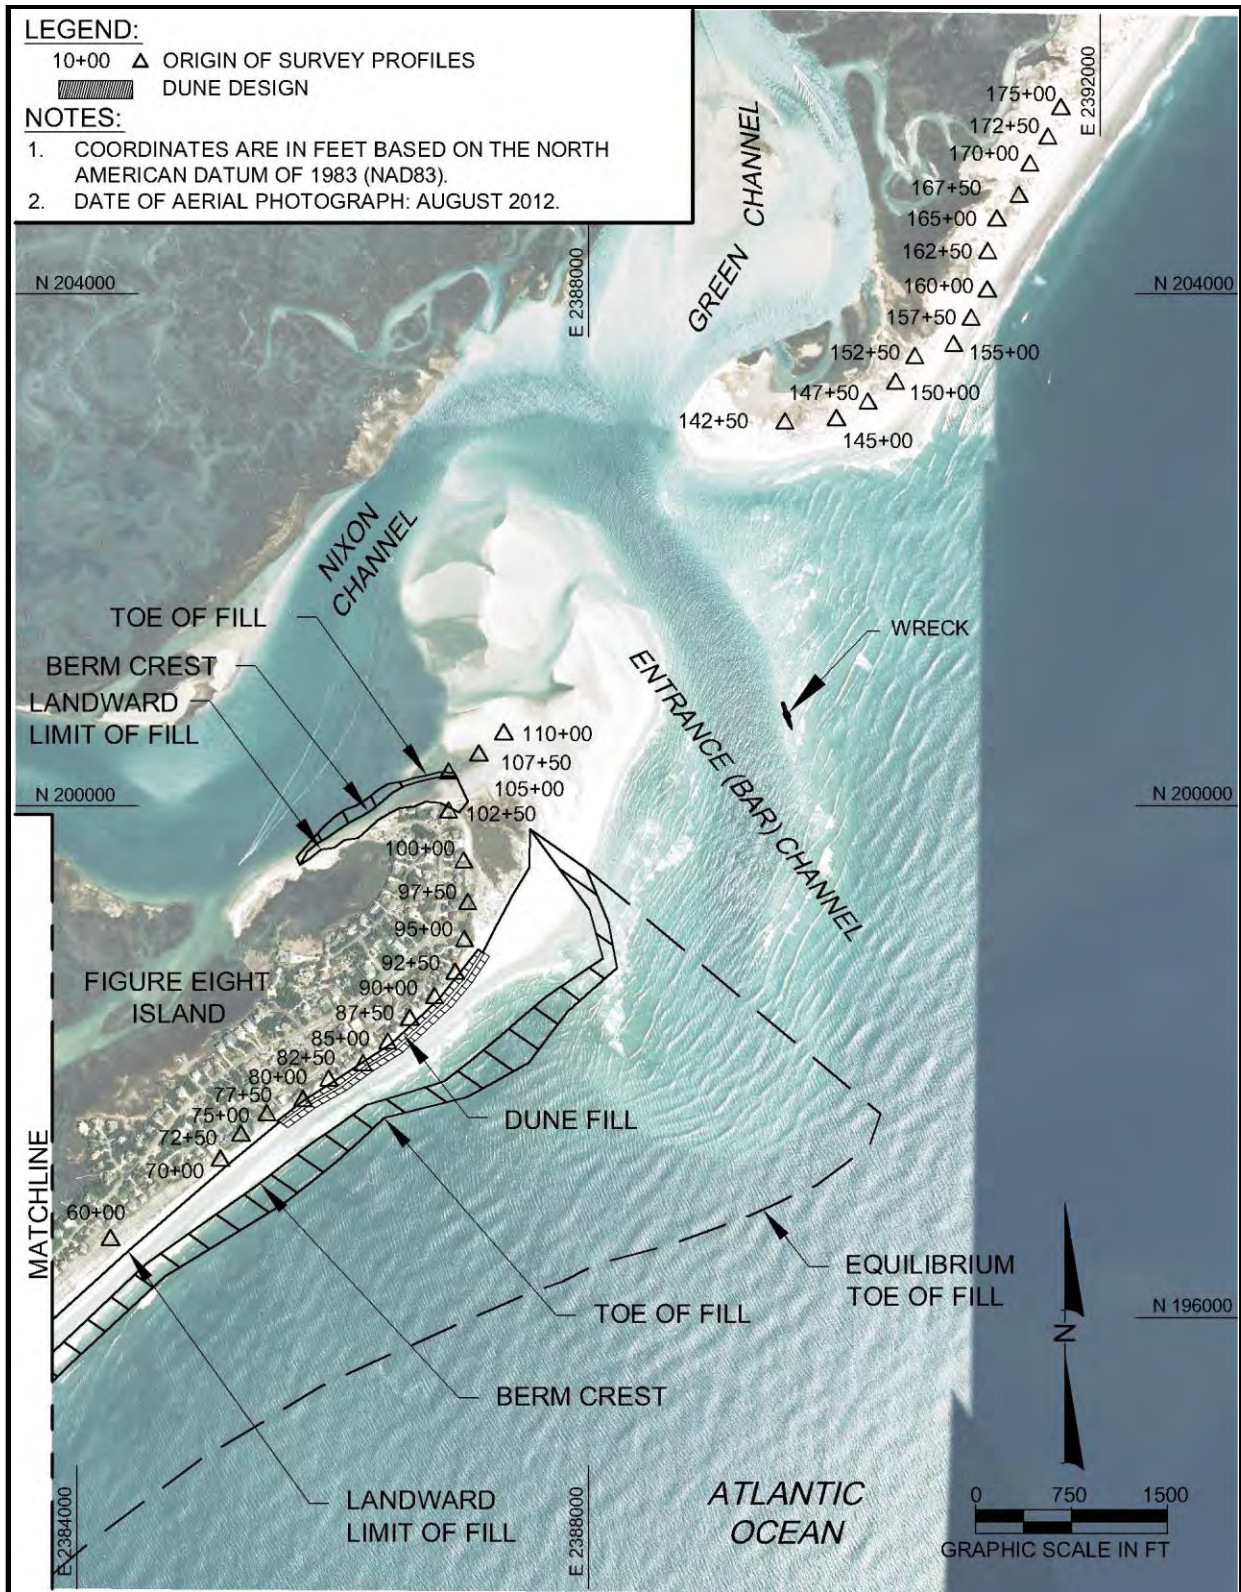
B: Alternative 4 Beach Fill Layout
